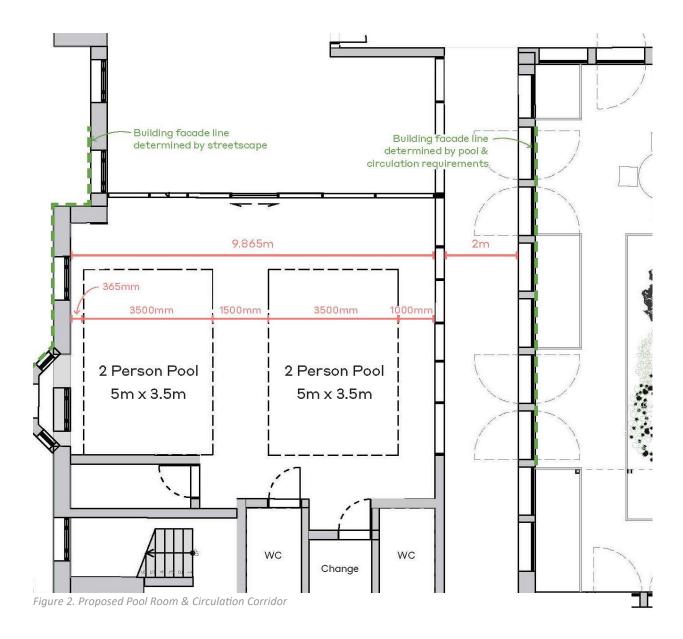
Example plan of a pool room layout – Innova Pools Technical Info
